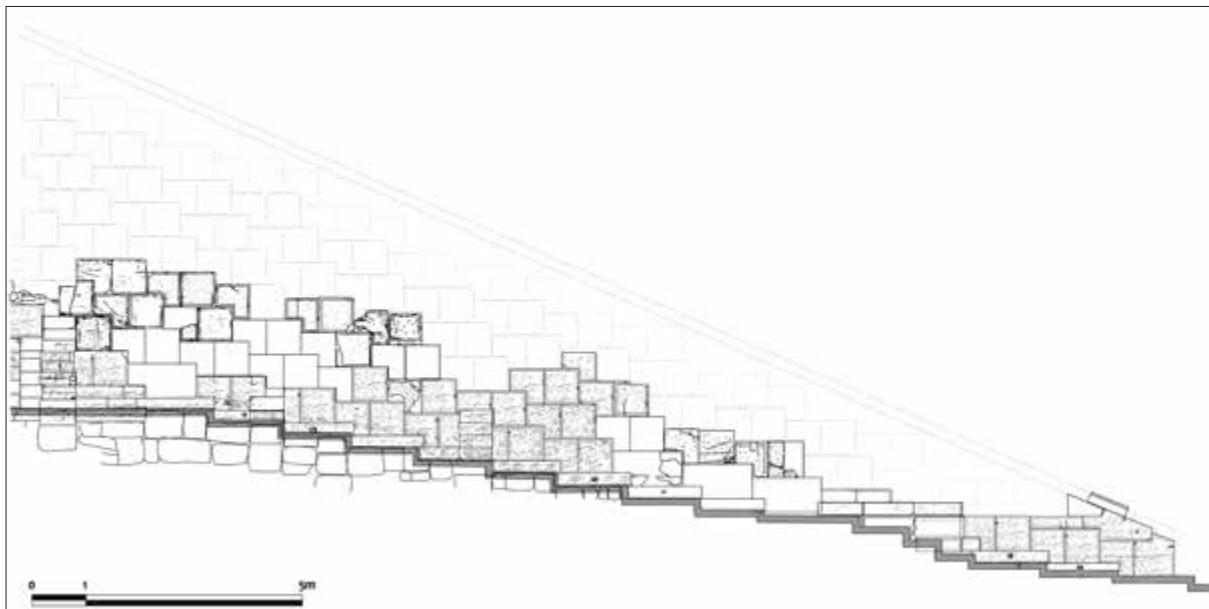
Retaining wall of W parodos. Reconstruction drawing of the façade.
